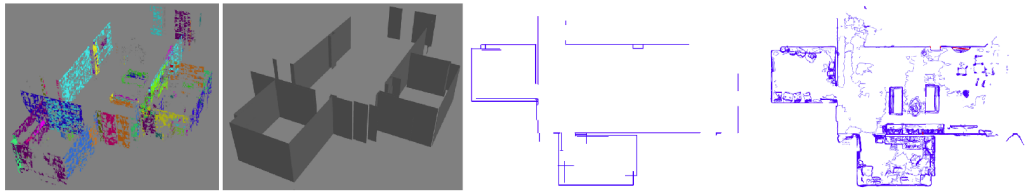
First: DBSCAN clustering results for building B2. Second: plane-fitted flat walls. Third: drafting-style floor plan. Fourth: pen-and-ink style floor plan.
